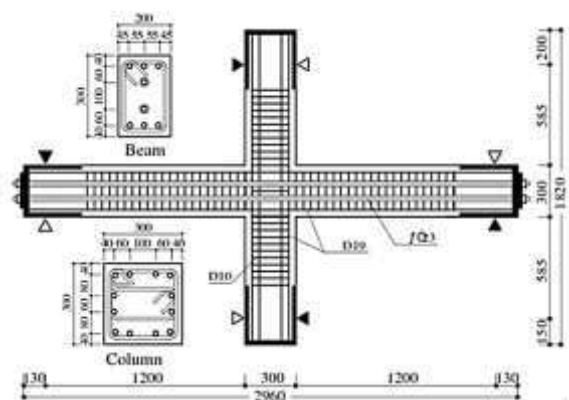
Sectional detail, reinforcement layout, and test setup of the partially prestressed concrete interior beam-column joint
